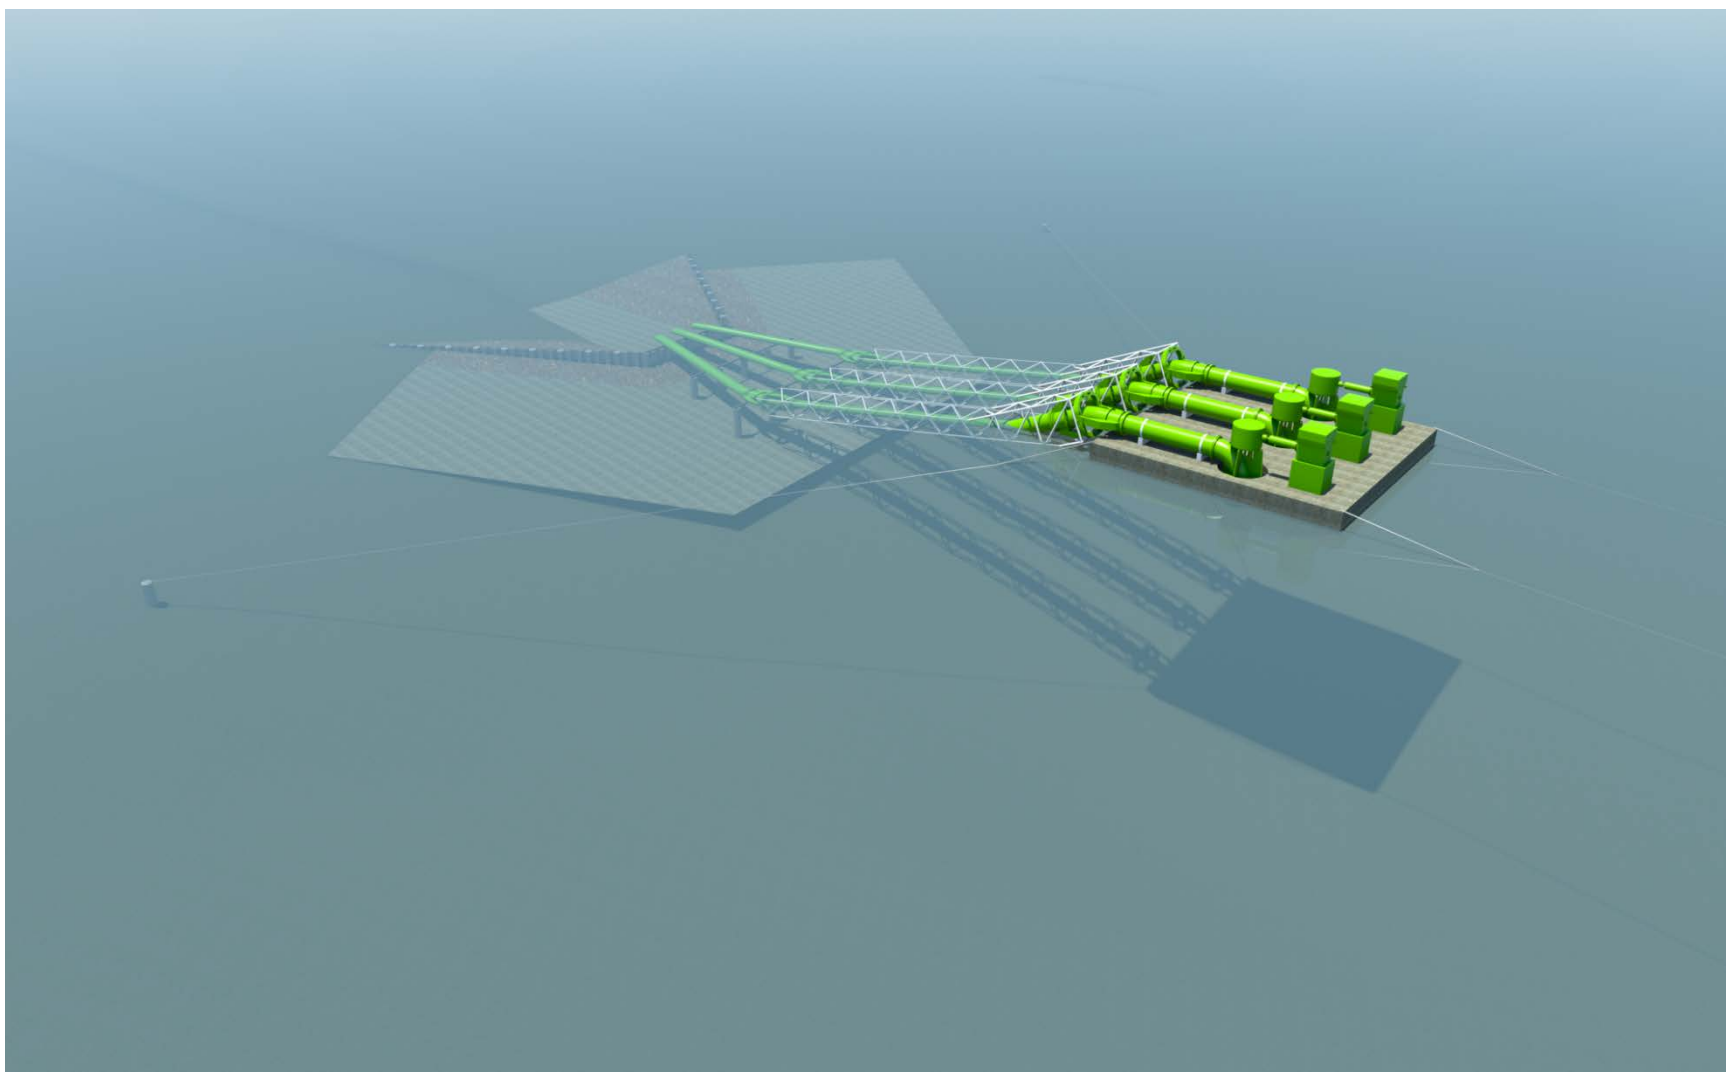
Floating Pumping Plant at Kachess Reservoir Maximum Pool – Gravity Operation
